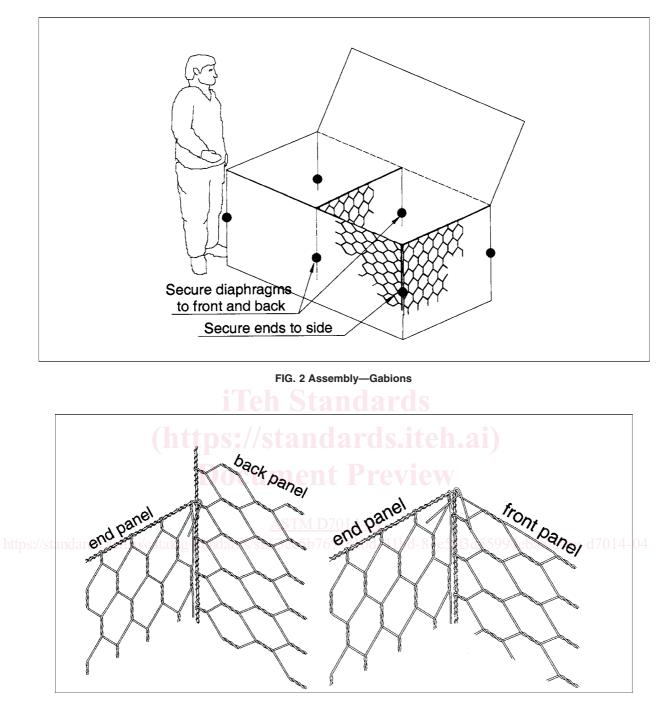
Assembly—Gabions—Selvedge Connection End and Front Panel to Back Panel
